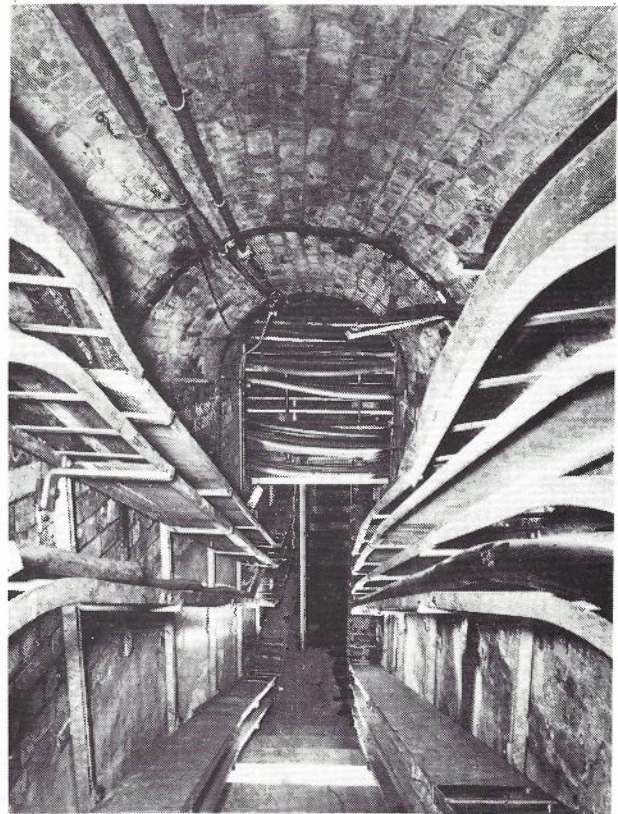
Intersection and Underpass, Pitt St. and Liverpool St. Tunnels (After Reconstruction).
